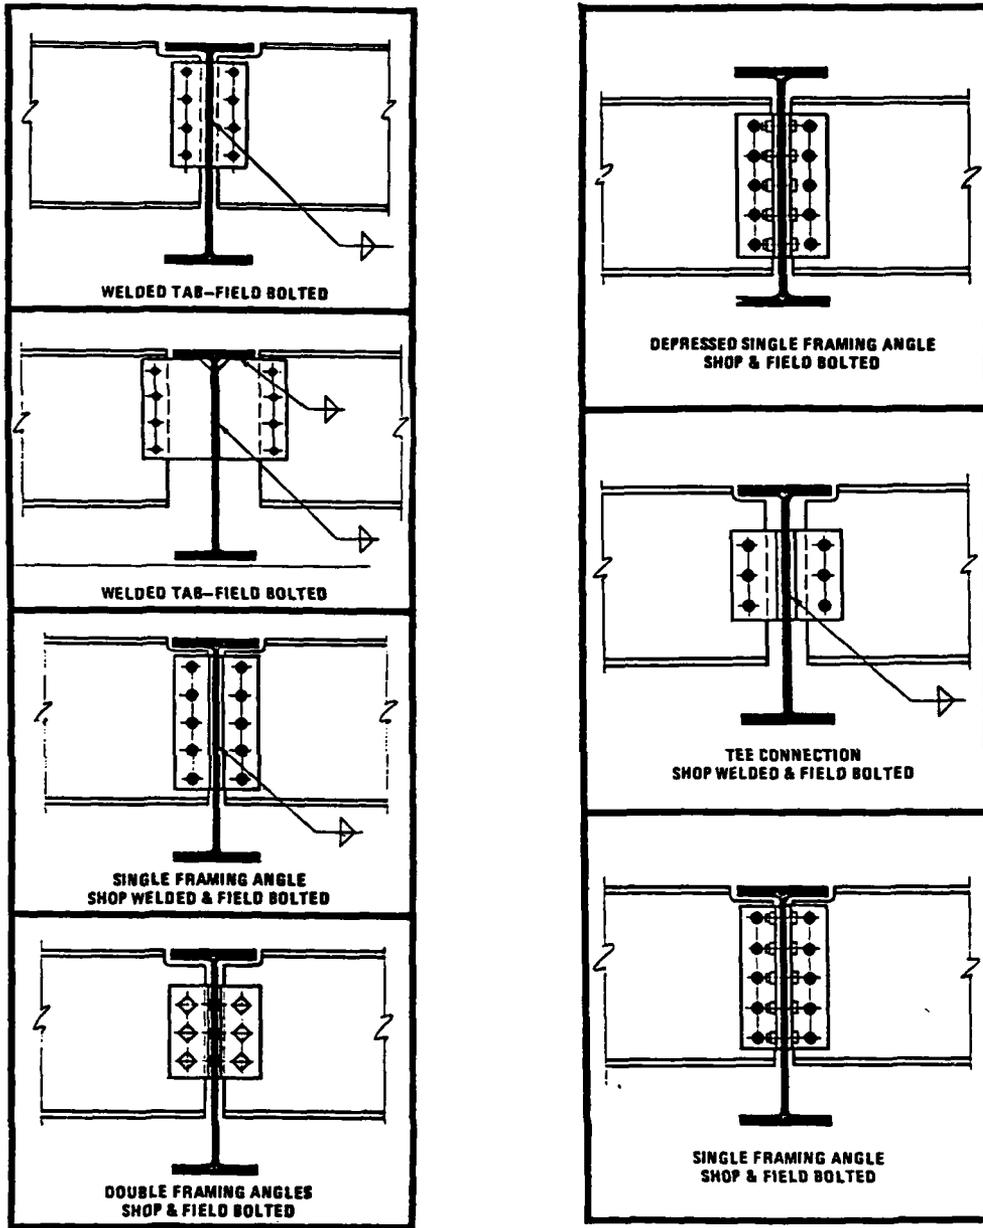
Shear Connections - Beam to Girder. (Ref. 24)
